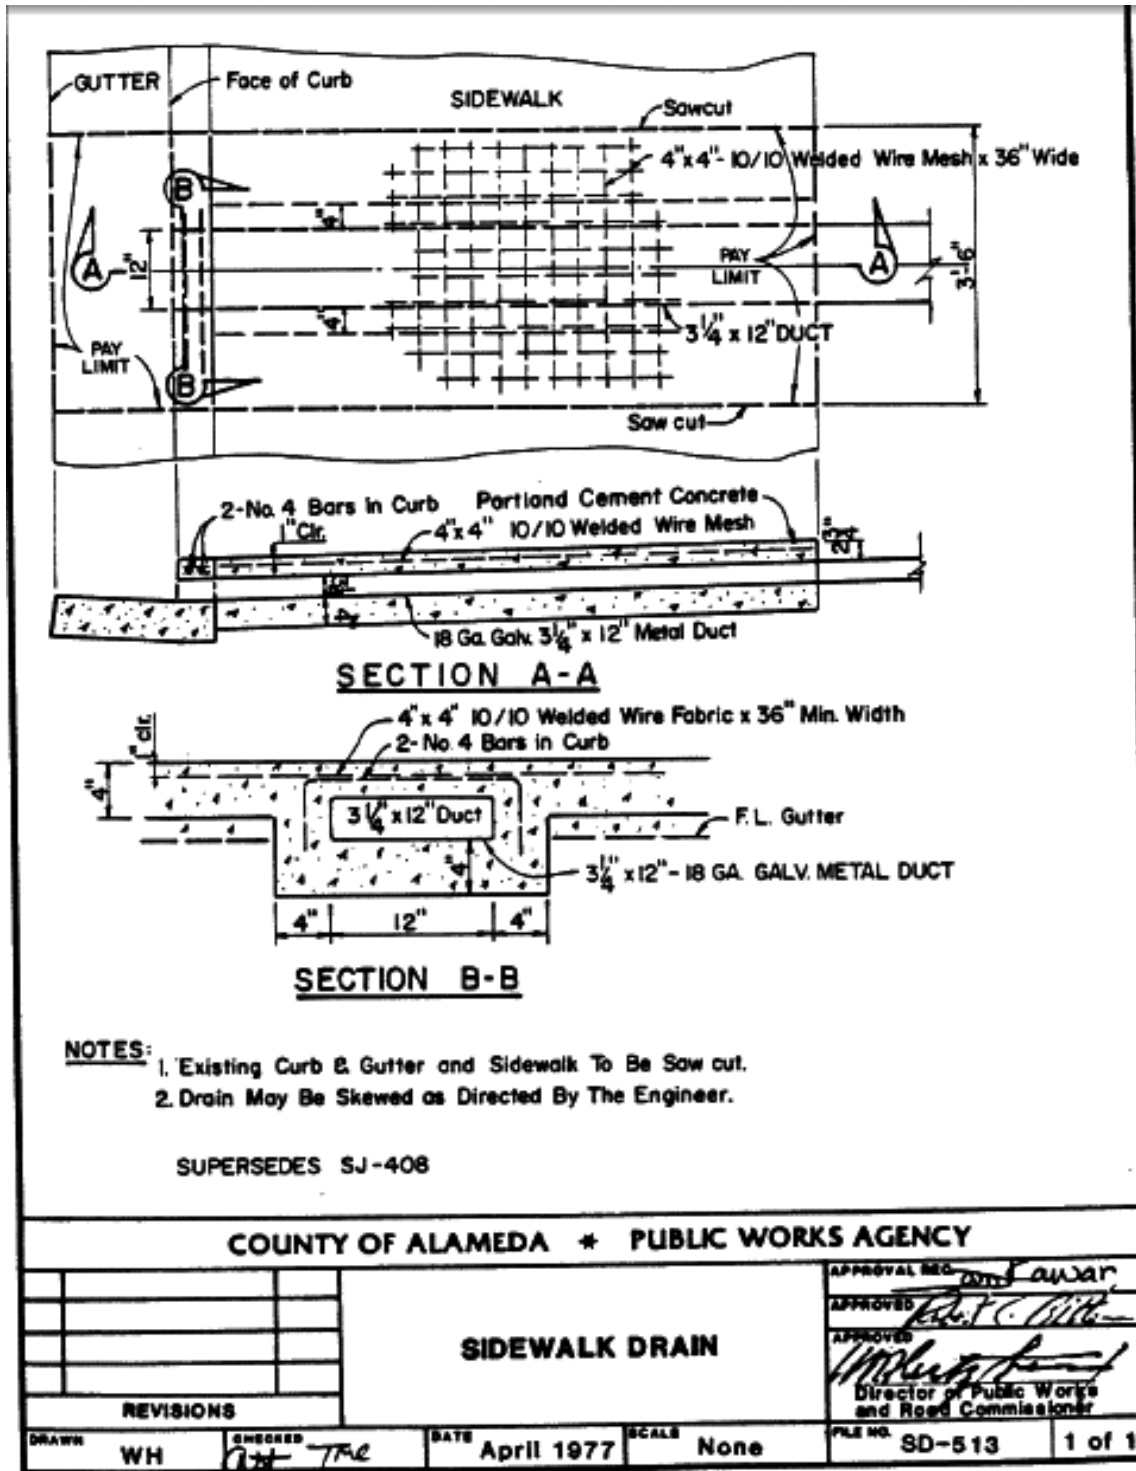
Alameda County Standard Detail 513, Sidewalk drain. This design may be used, as an alternative to plans shown in figures 5-19 and 5-20, to drain water from street gutter, across sidewalk, to stormwater treatment facility.
